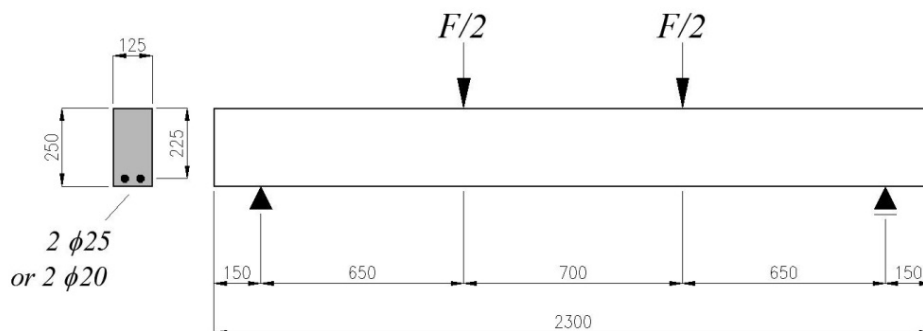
Geometry and loading configuration of the beams in High Strength Concrete [CAS1996]
